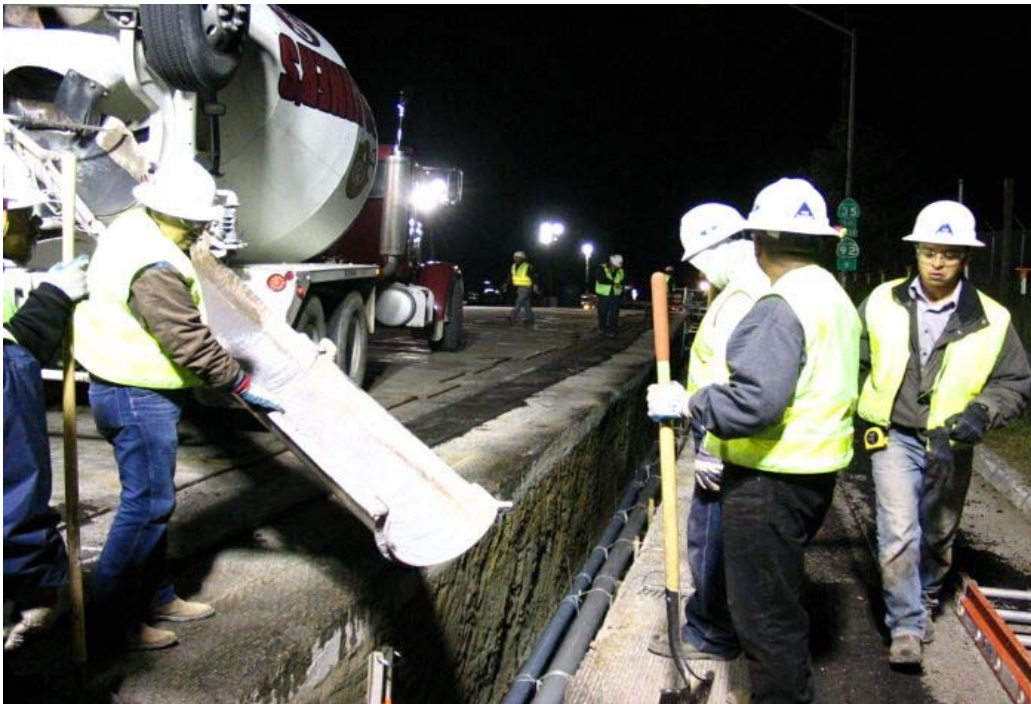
Crews pouring cement slurry in trench north of Manhole #20 in the Caltrans area on Skyline Boulevard, Segment 1, April 25, 2005.
